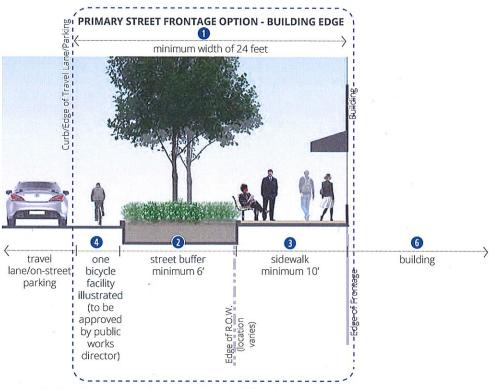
Primary Street Frontage Option - Building Edge
